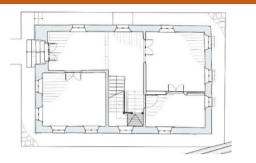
Ground floor plan of the registered house with block 137, lot 32 (drawn by Aynur Duysak Mankır, Mostar Architecture, 2018)
